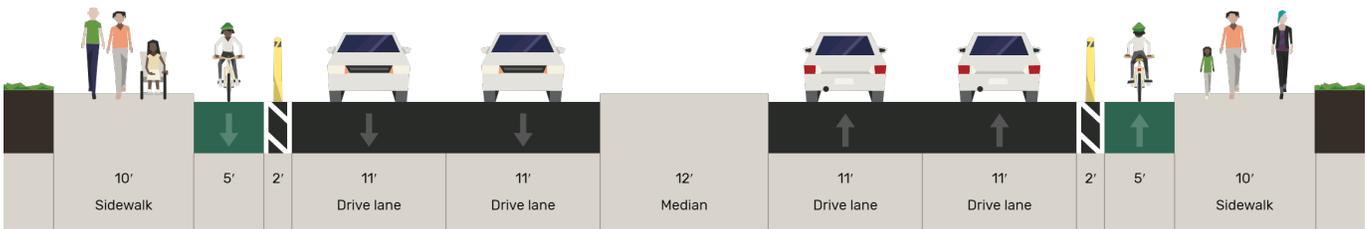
San Pablo Avenue (South) – Alternative 2 General Cross Section (Facing North)
